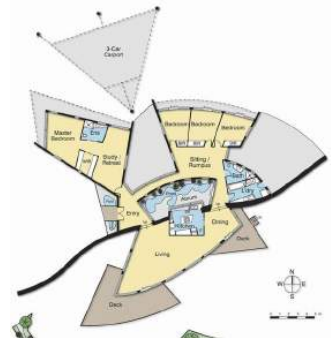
Floorplan. (Source: Realestate.com.au 2016)
